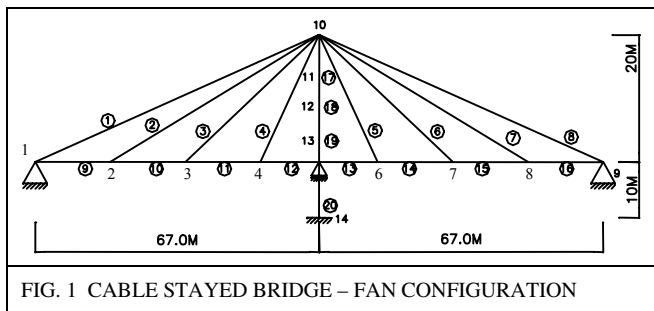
CABLE STAYED BRIDGE – FAN CONFIGURATION
